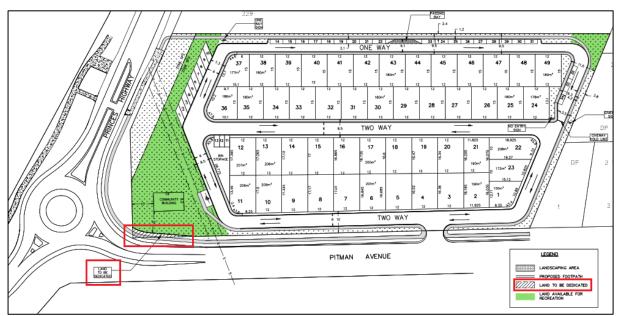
Approved Layout Plan – land to be dedicated outlined in red (adapted from plan by Allen Price and Scarratts)
